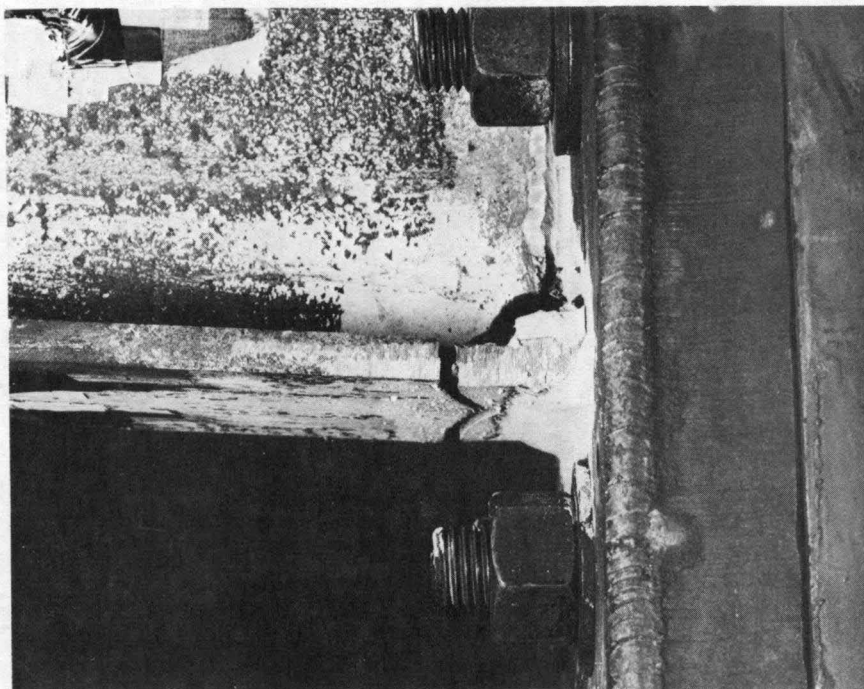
CRACKING OF THE TENSION FLANGE OF
